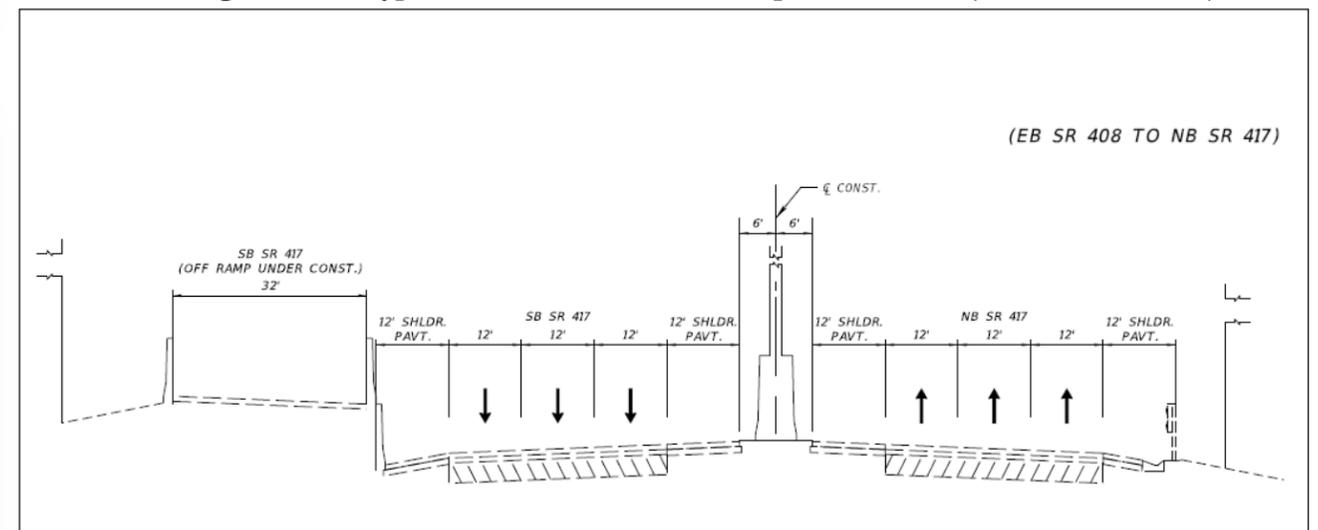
Typical Section at SR 417 Underpass at SR 408 (Structure #750825)
